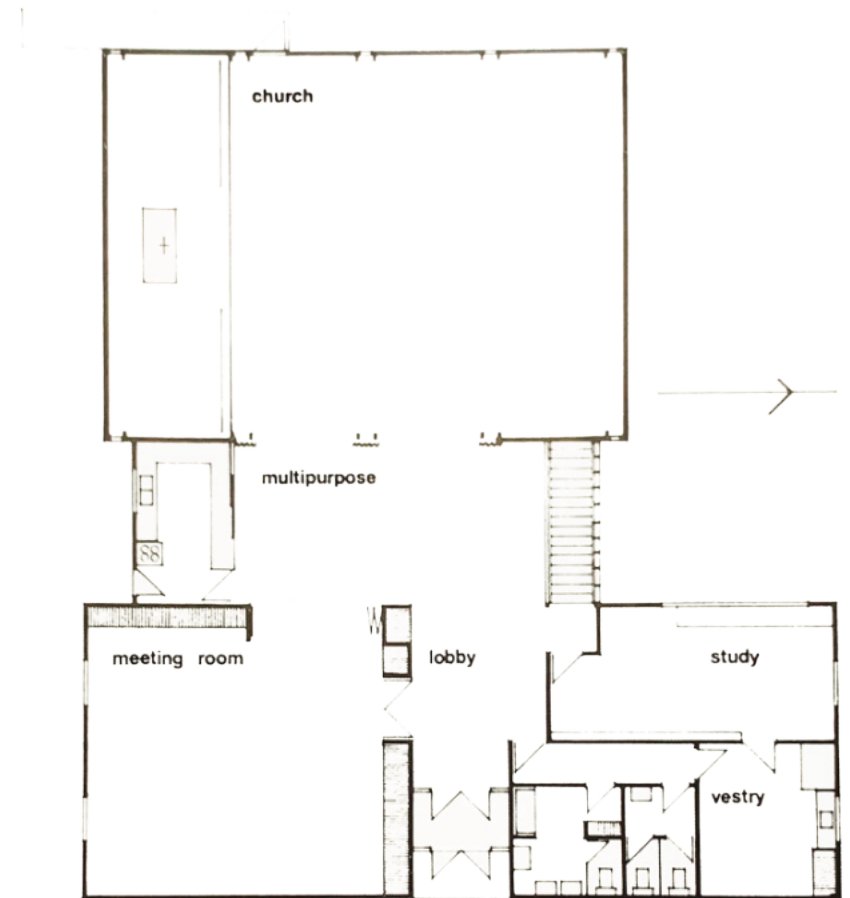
Plan of St Matthews Church. (Plan by Derek Wilson, "Plan of St Matthews," in Stratford, Architects 1950-1980, 180.)
